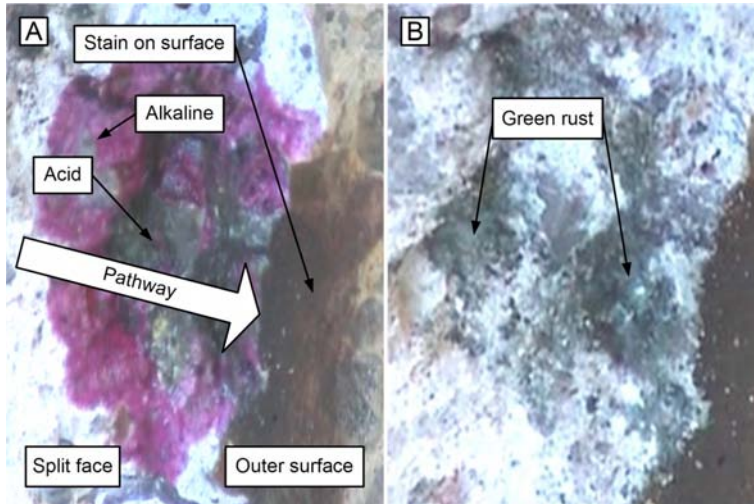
Split chloride contaminated reinforced concrete block with a severely corroded embedded carbon steel rebar. Specimen from [Nygaard, 2003]. [A]: Phenolphthalein applied on split face (cf. Section 3.1.7.2) and identification of regions of interest. [B]: Traces of green rust, also referred to as ‘GR1’, on the split surface before application of phenolphthalein.
